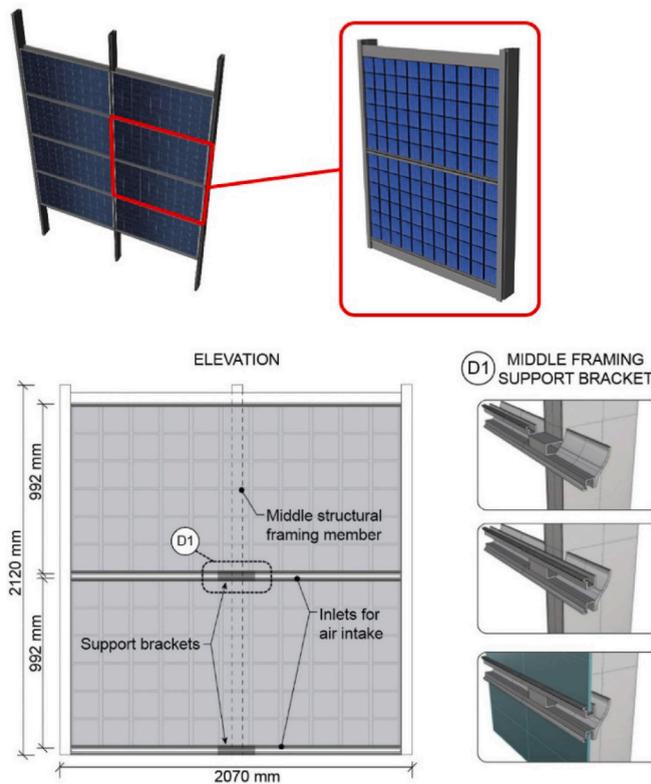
BIPV/T curtain wall prototype adopted from [184].
